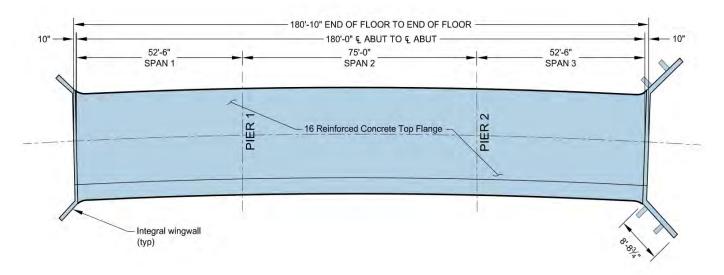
EI.24.4- 2: Plan view of concrete rigid frame
